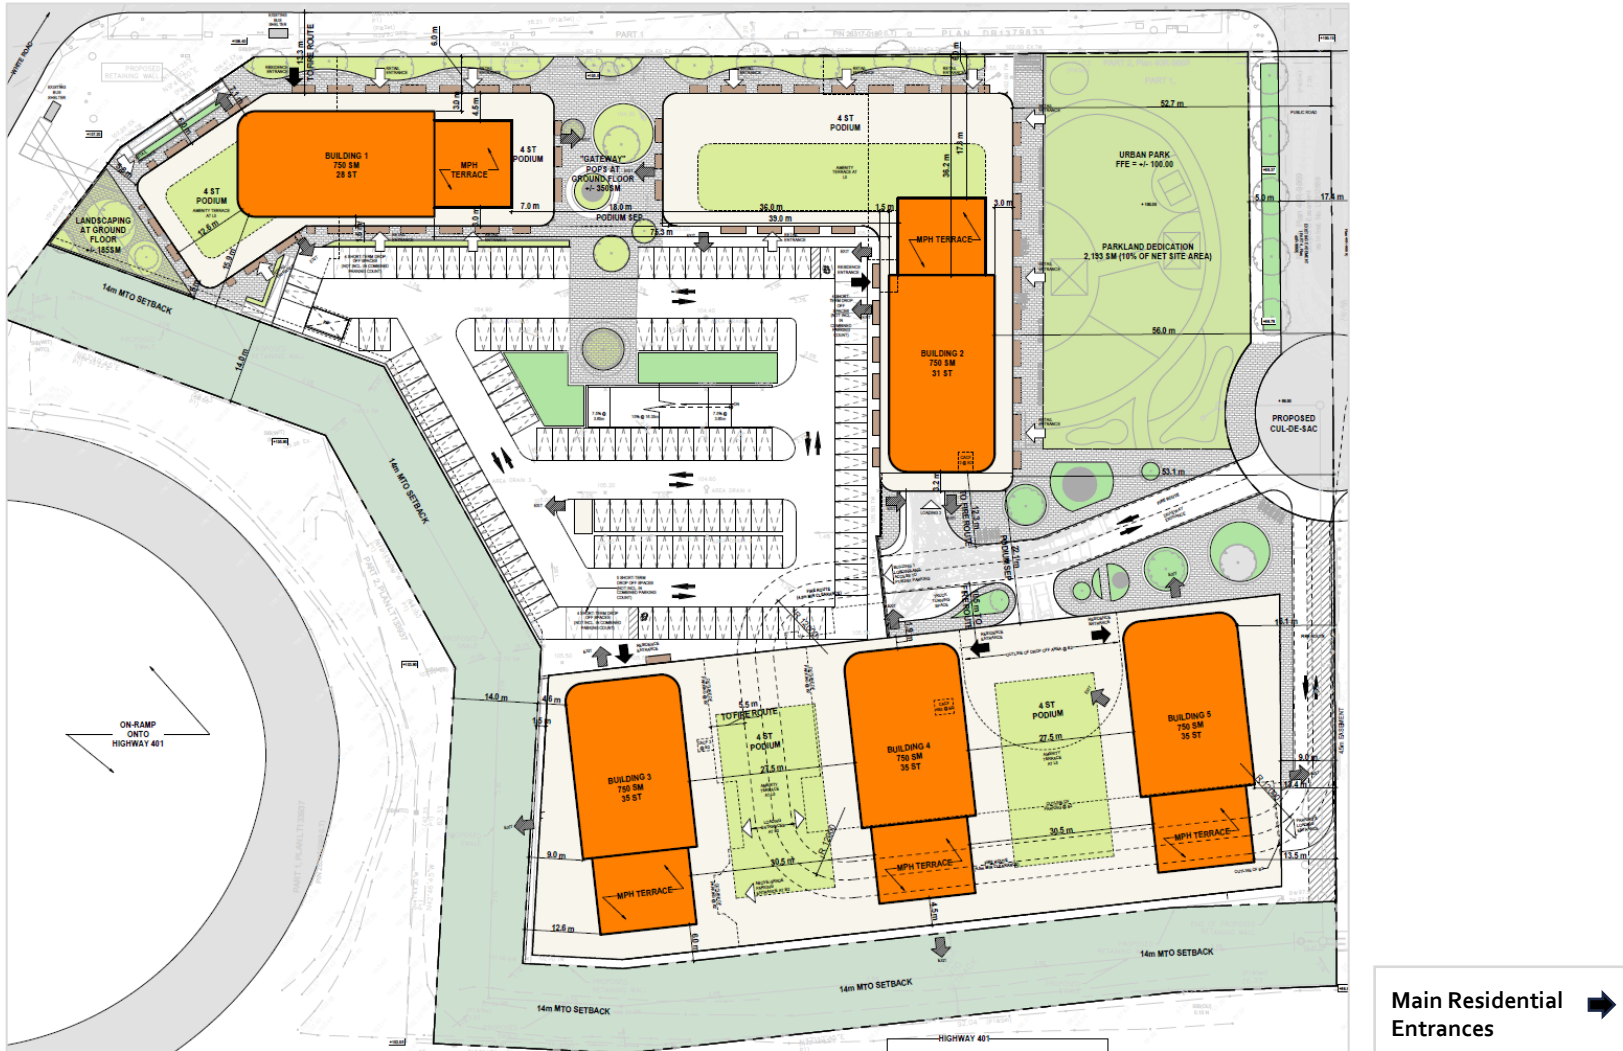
Proposed Site Plan, Courtesy: BDP Quadrangle Inc.
